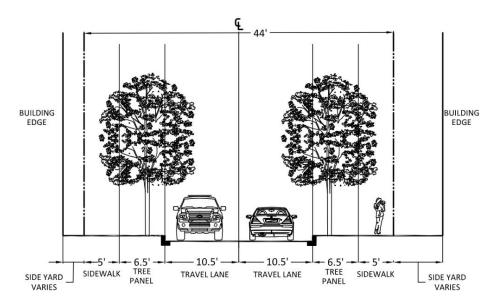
Private Street A Without On-Street Parking Cross-Section
